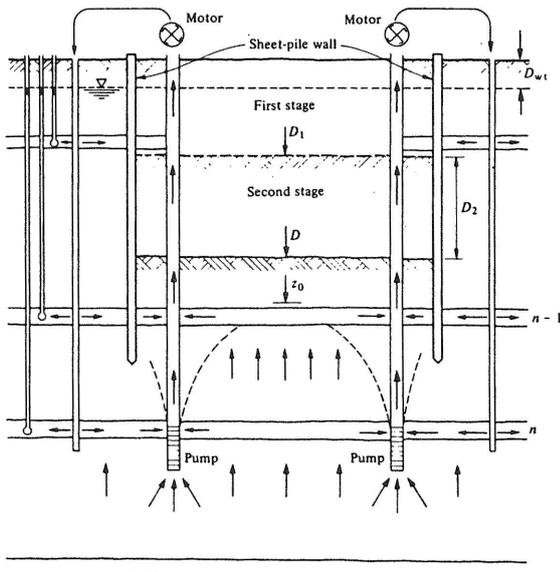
Dewatering and recharging for an excavation (from L. Zeevaert, 1972).
